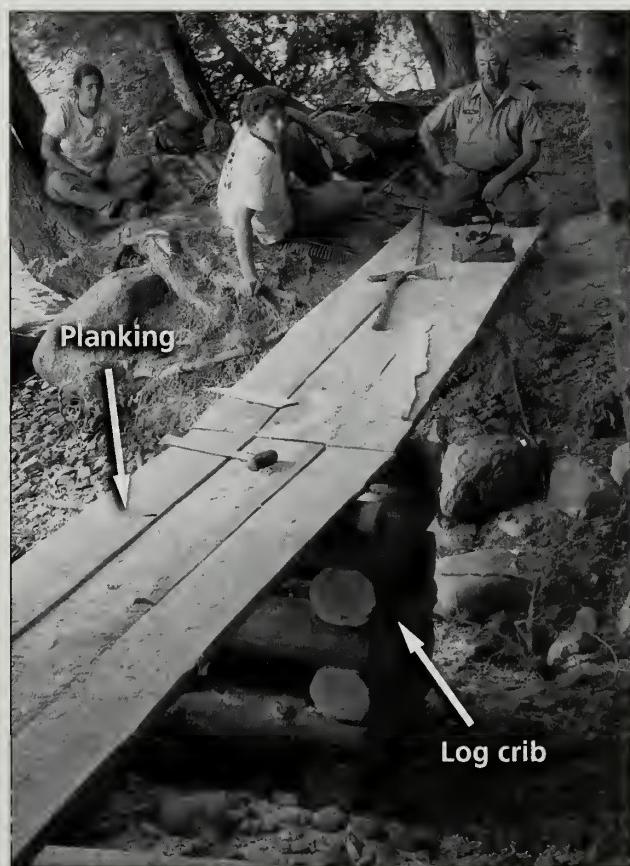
Youth Conservation Corps bridge on the Beech Mountain West Ridge Trail (#108), built in 1997.
